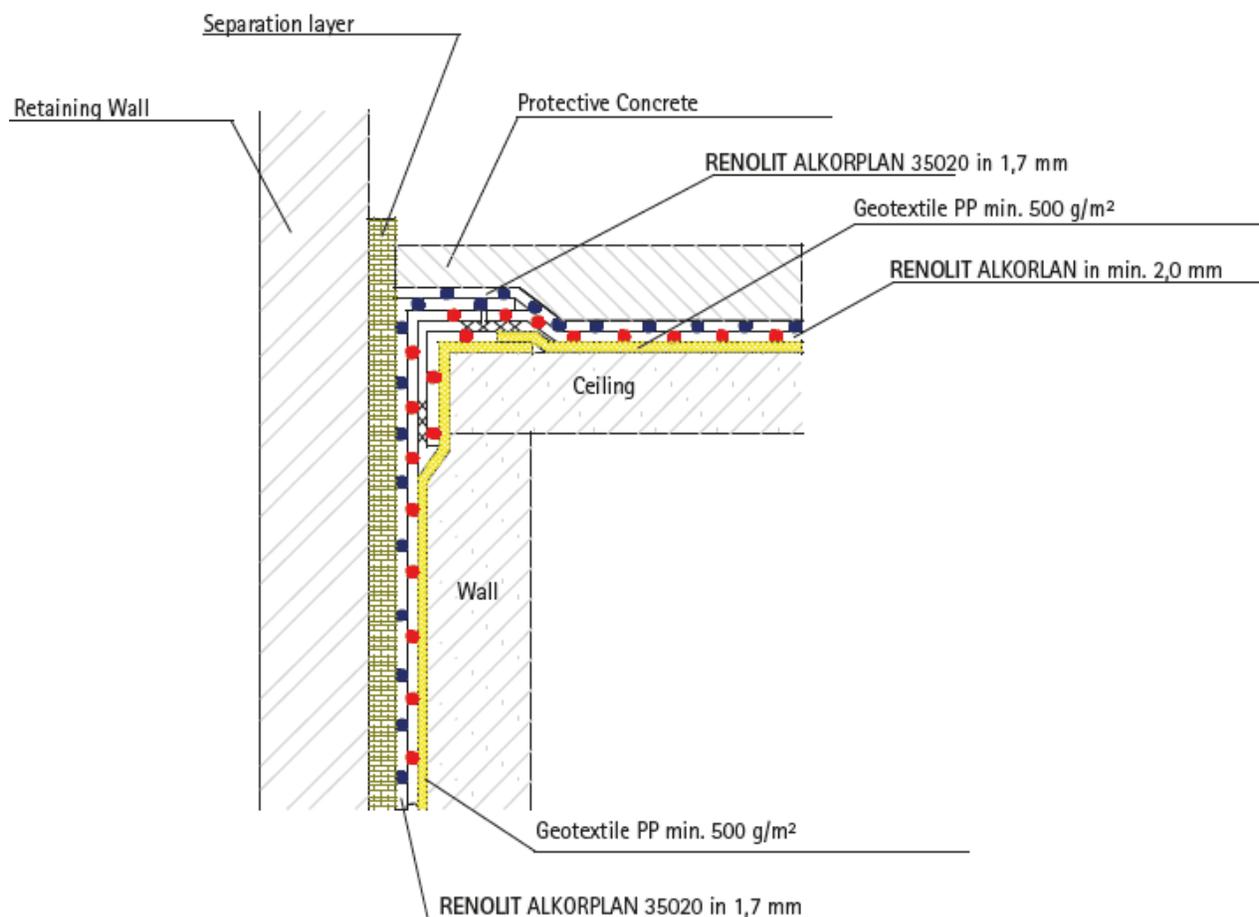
Waterproofing of the top slab without working space<sup>[16]</sup>
